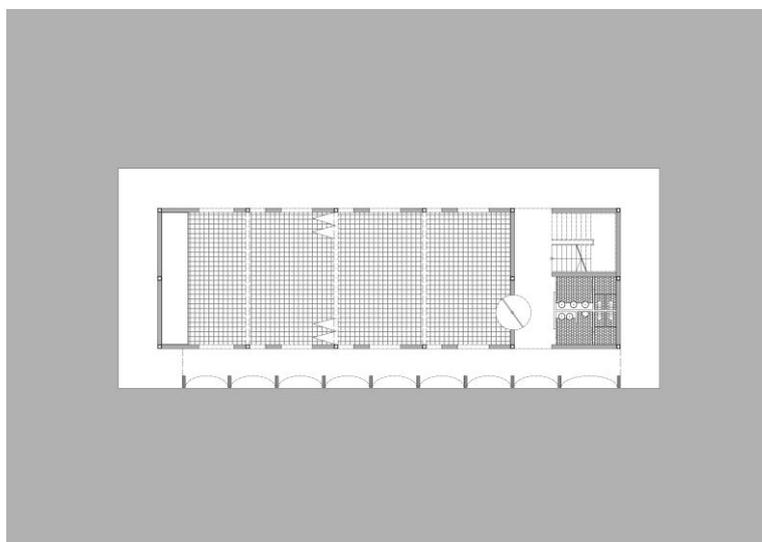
KKU Faculty of Architecture, Textile Workshop. General layout plan © Alexandru Calin
